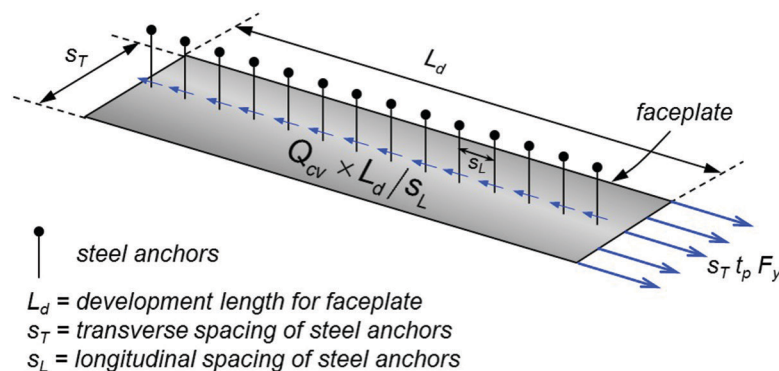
Yielding steel anchor spacing requirement (Zhang et al., 2014).
